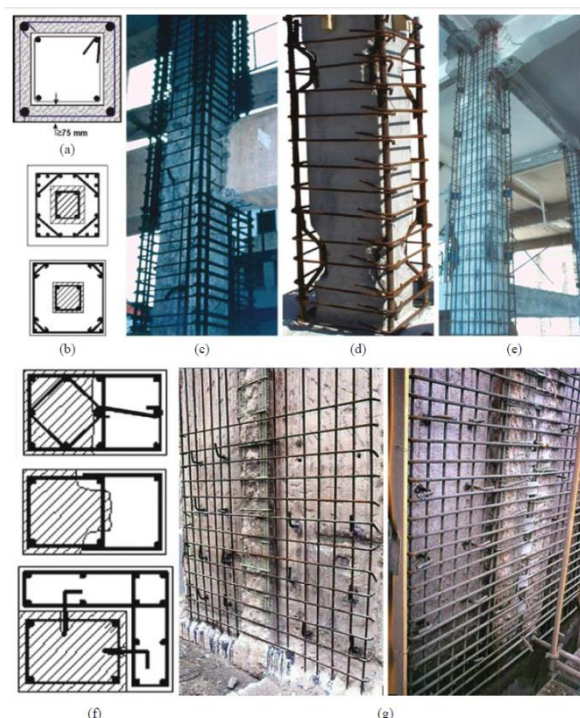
Concrete jackets in columns: a) simplest case b) jacket bars bundled near corners, engaged by cross-ties or orthogonal tie c) jacket bars bundled at corners, dowels at interface with old column d) U-bars welded to corner bars e) steel plates welded to corner bars f) one- or two-sided jackets g) one-sided concrete overlay with single curtain of two way reinforcement at exterior face of perimeter walls [2]
